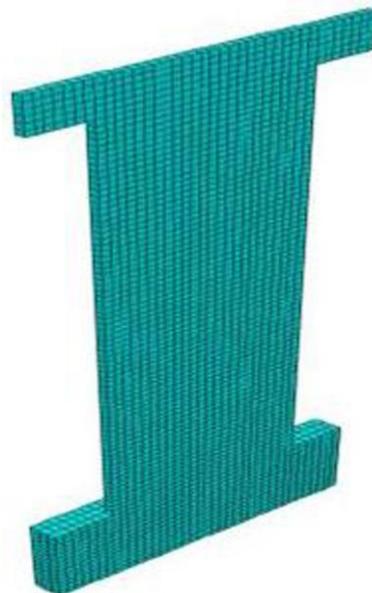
The meshed model of wall tested by Thomsen and Wallace
